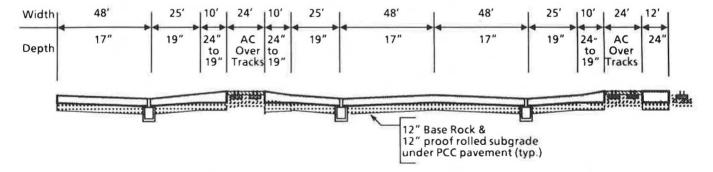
Cross section through width of PCC pavement (not to scale).
